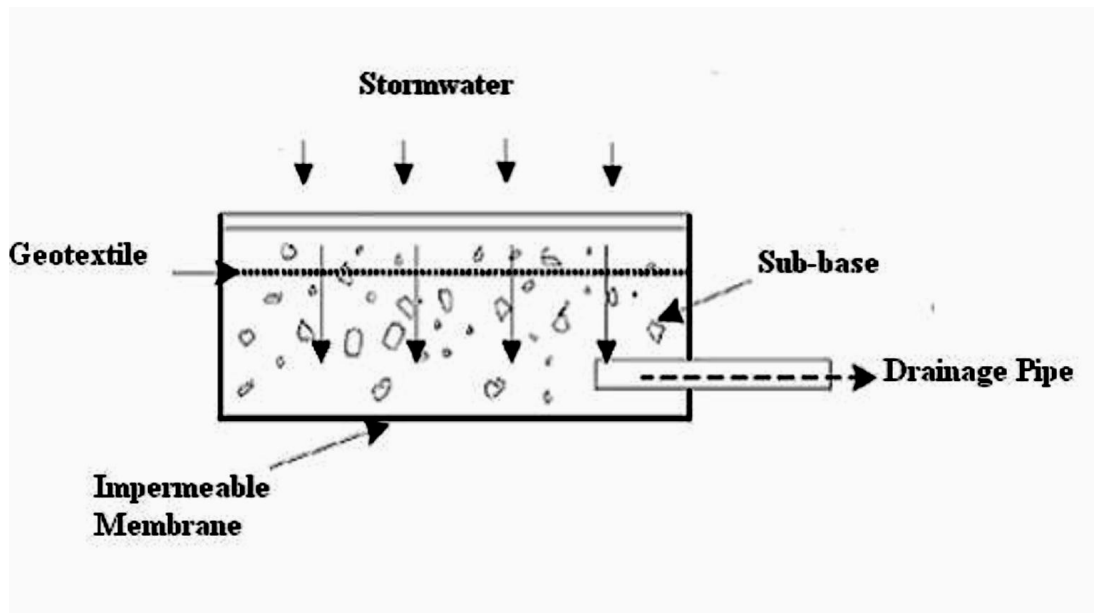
Pervious pavement used for attenuation (NAPA, 2003)
